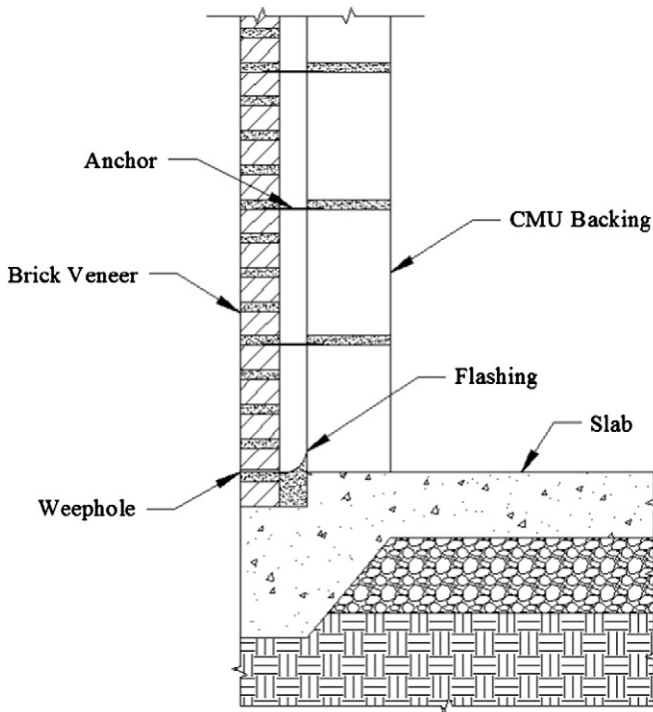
Typical cross section of a brick veneer anchored to a CMU wall.
